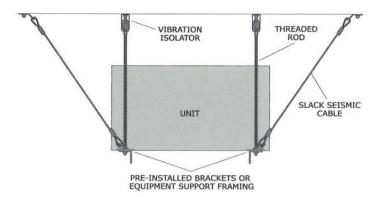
Side view of vibration-isolated, suspended attachment to the building structure.
